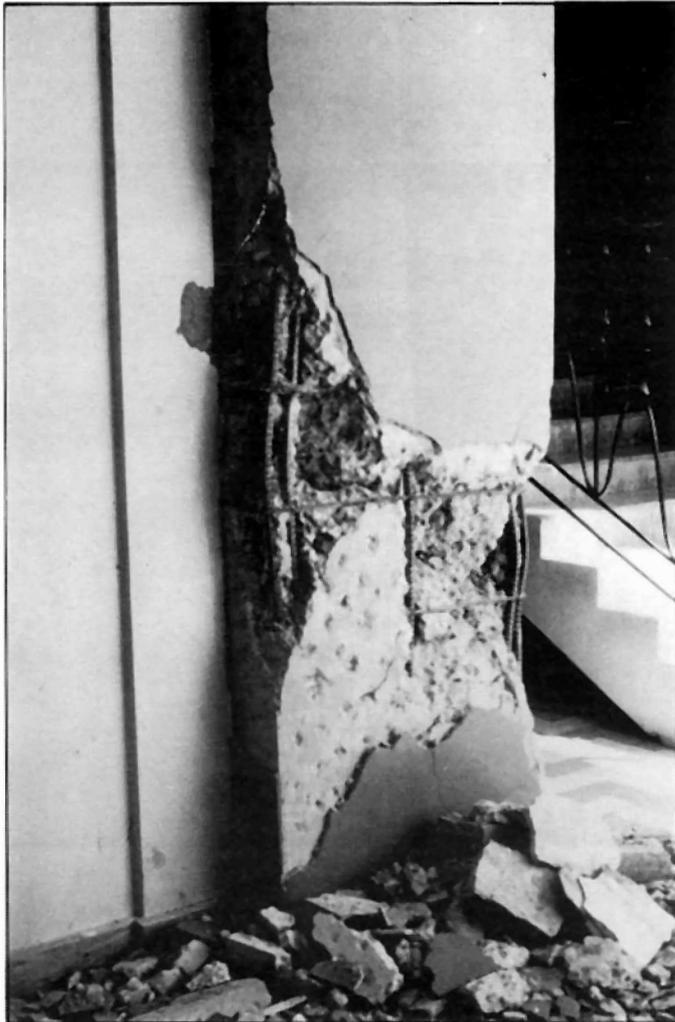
COLUMN FAILURE AT COLEGIO
